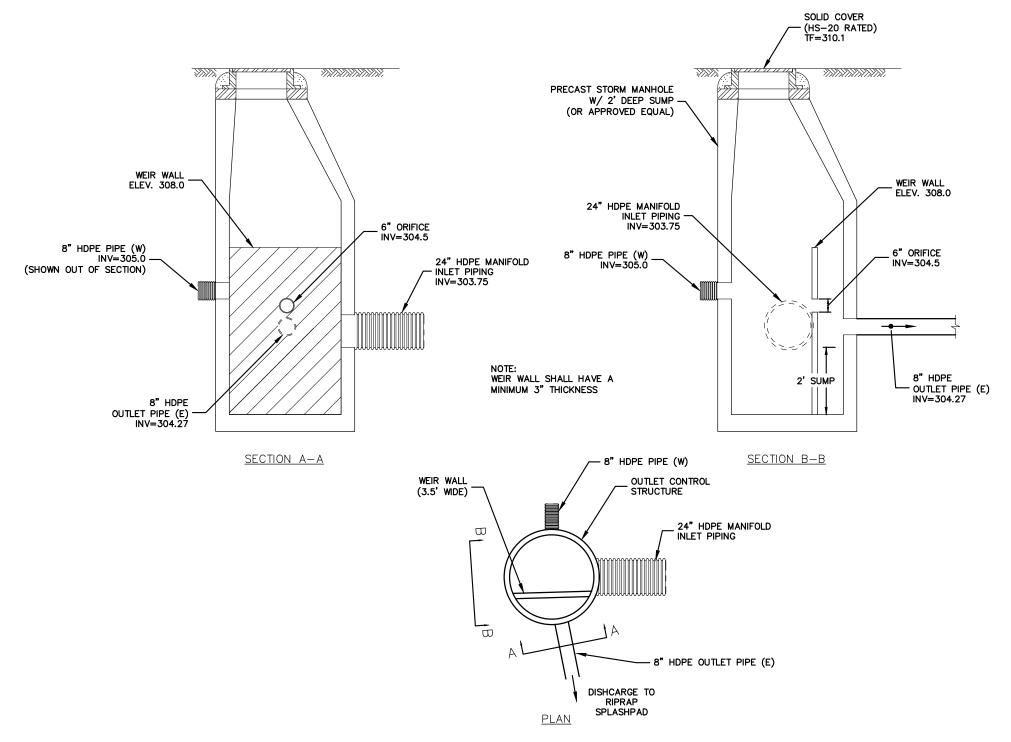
OUTLET CONTROL STRUCTURE (OCS-1) AND PIPING DETAIL N.T.S
